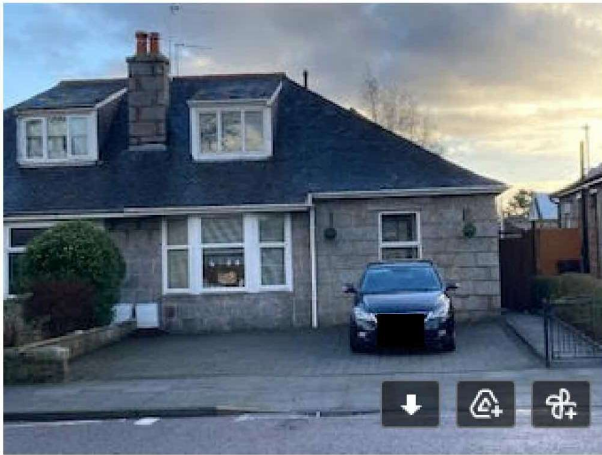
Demonstrating that 7 Cromwell Road has removed almost all of the low-lying granite wall to create a large car park.
